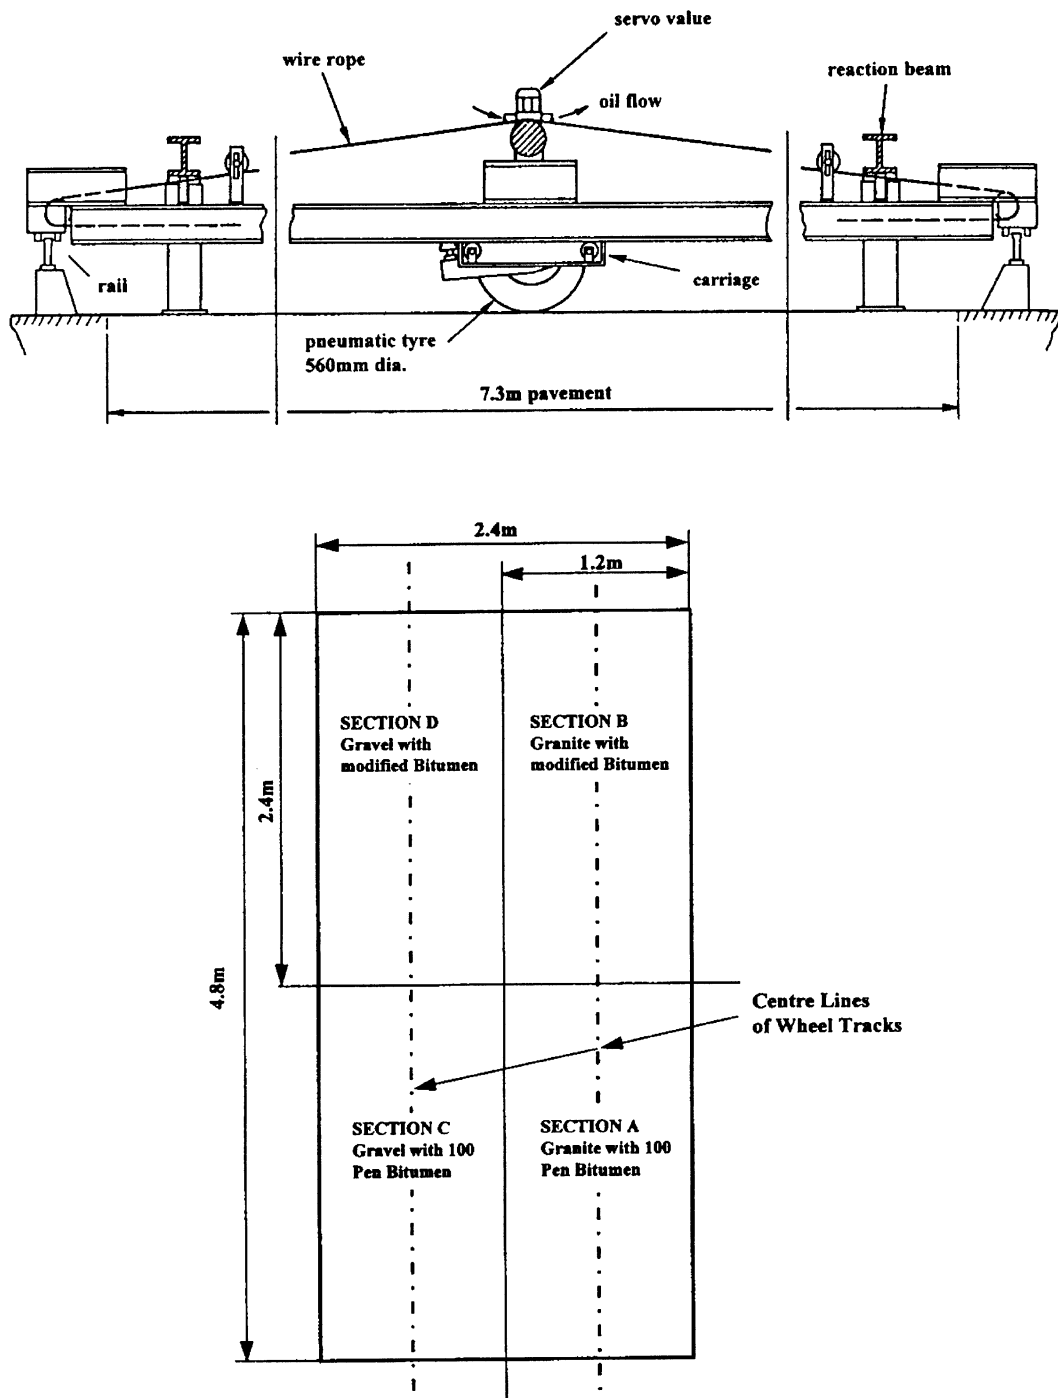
Nottingham PTF and plan view of test sections [21].
